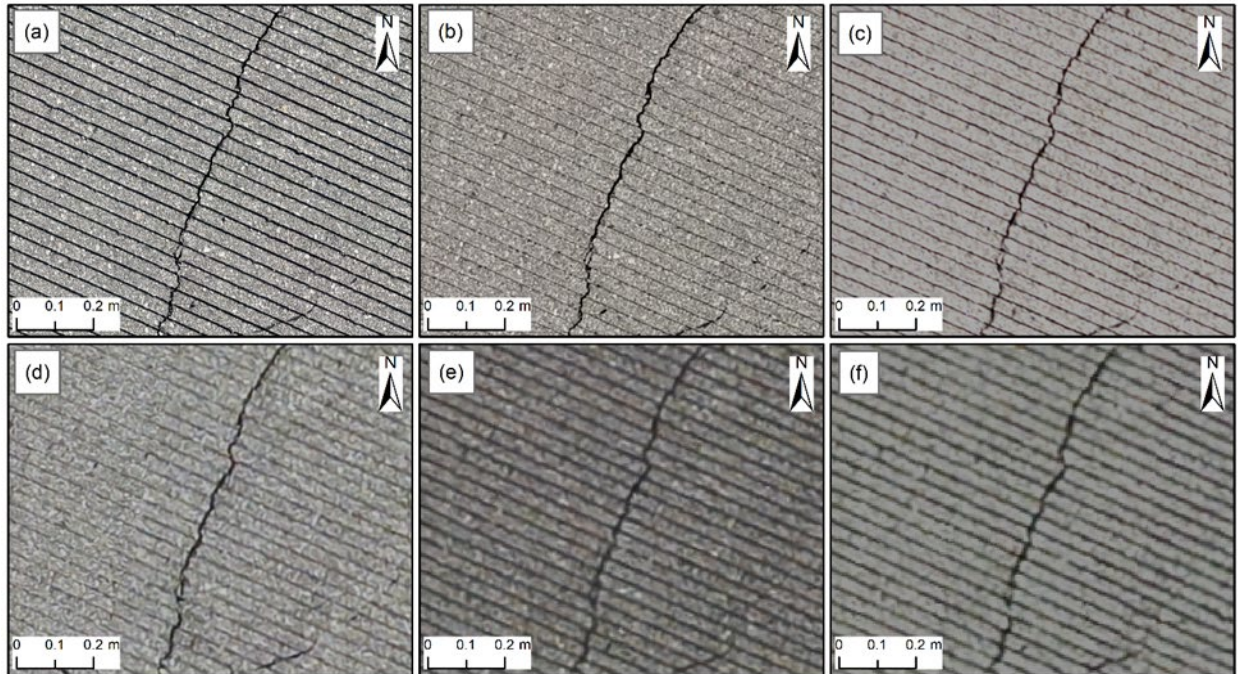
Unsealed Longitudinal and Transverse Cracks (L) and Weathering (L) on Asphalt Overlay Over Asphalt Concrete Pavement at TTF: (a) 0.8-mm/pix Orthophoto, (b) 1.5-mm/pix Orthophoto, (c) 2.3-mm/pix Orthophoto, (d) 2.5-mm/pix Orthophoto, (e) 4.9-mm/pix Orthophoto, and (f) 5.7-mm/pix Orthophoto
